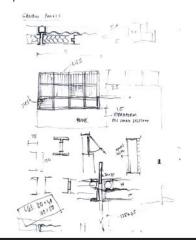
Wall panels - sandwich panel construction and assembly
